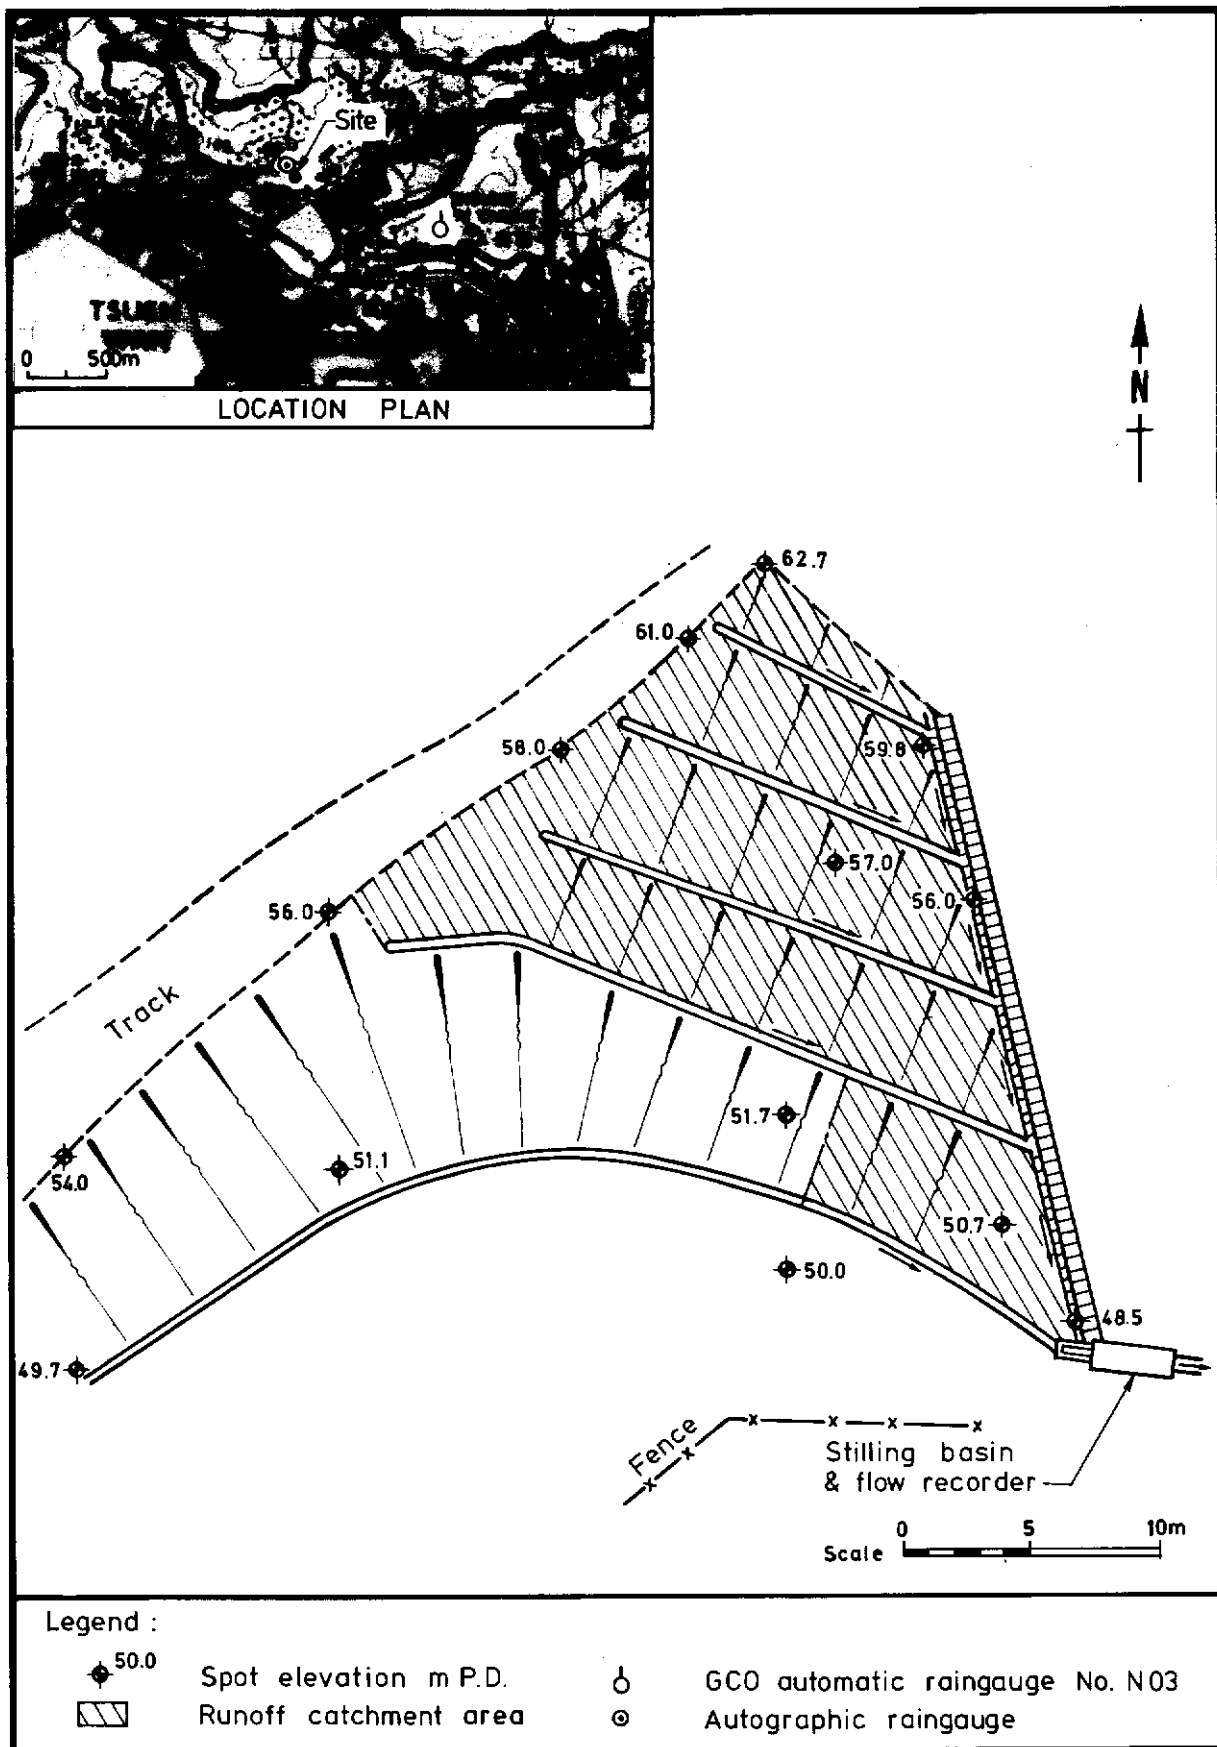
Site Plan for the Runoff Plot at Tsuen Wan (TWB)
